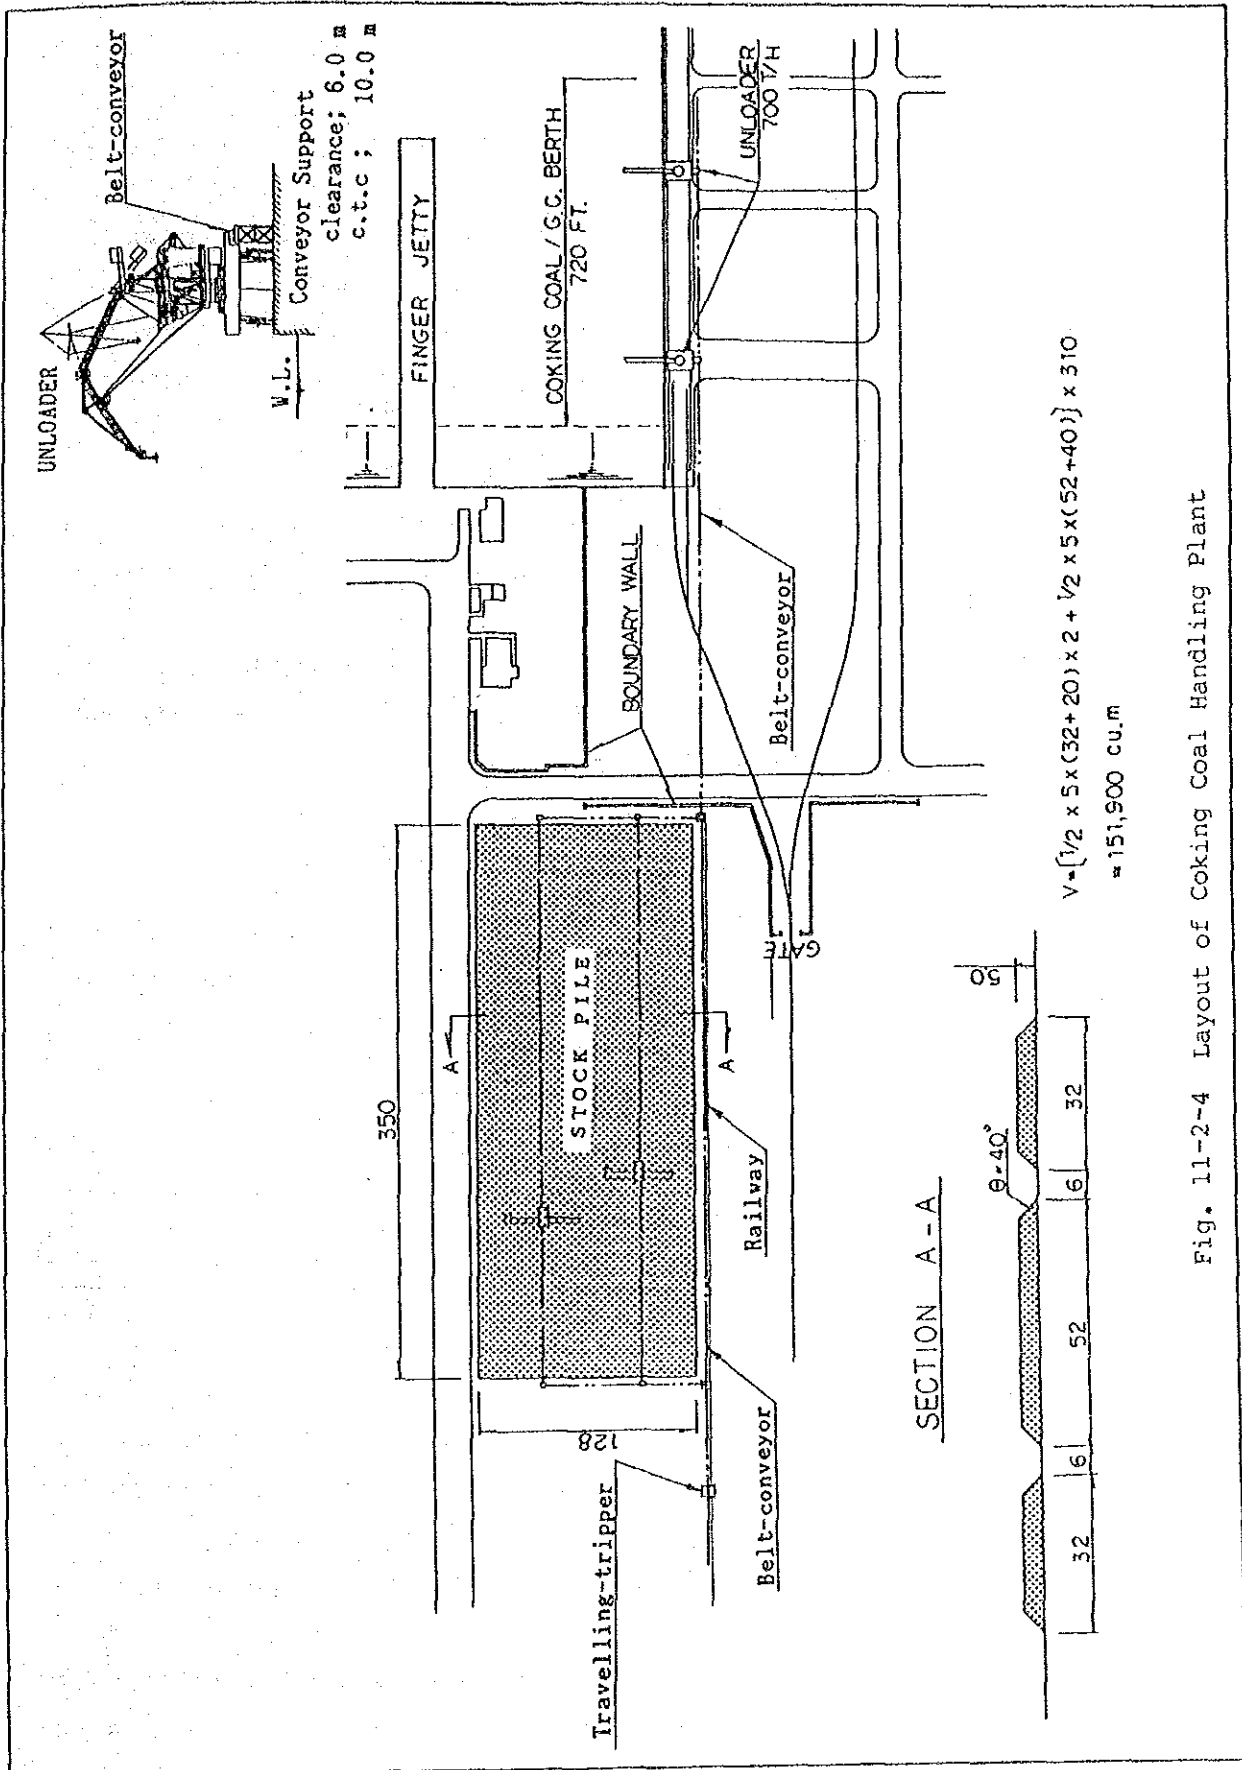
Layout of Coking Coal Handling Plant
